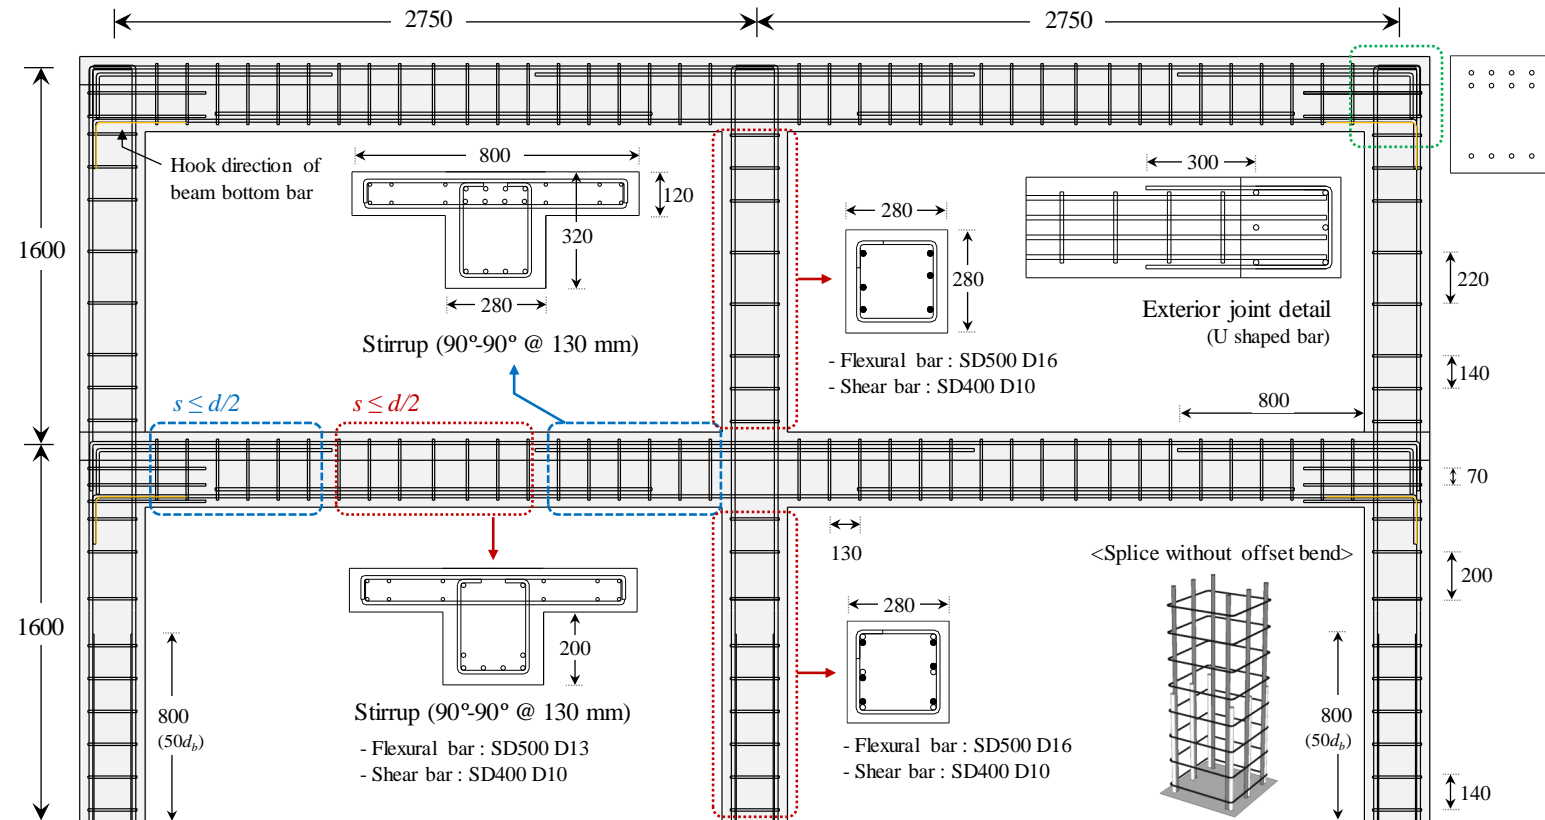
Dimensions and reinforcement details of the intermediate moment frame specimen (A1F)
